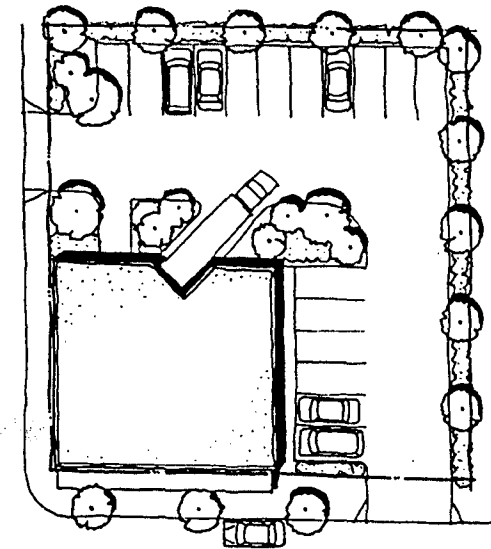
Locate parking behind building, incorporating screening from the street.
